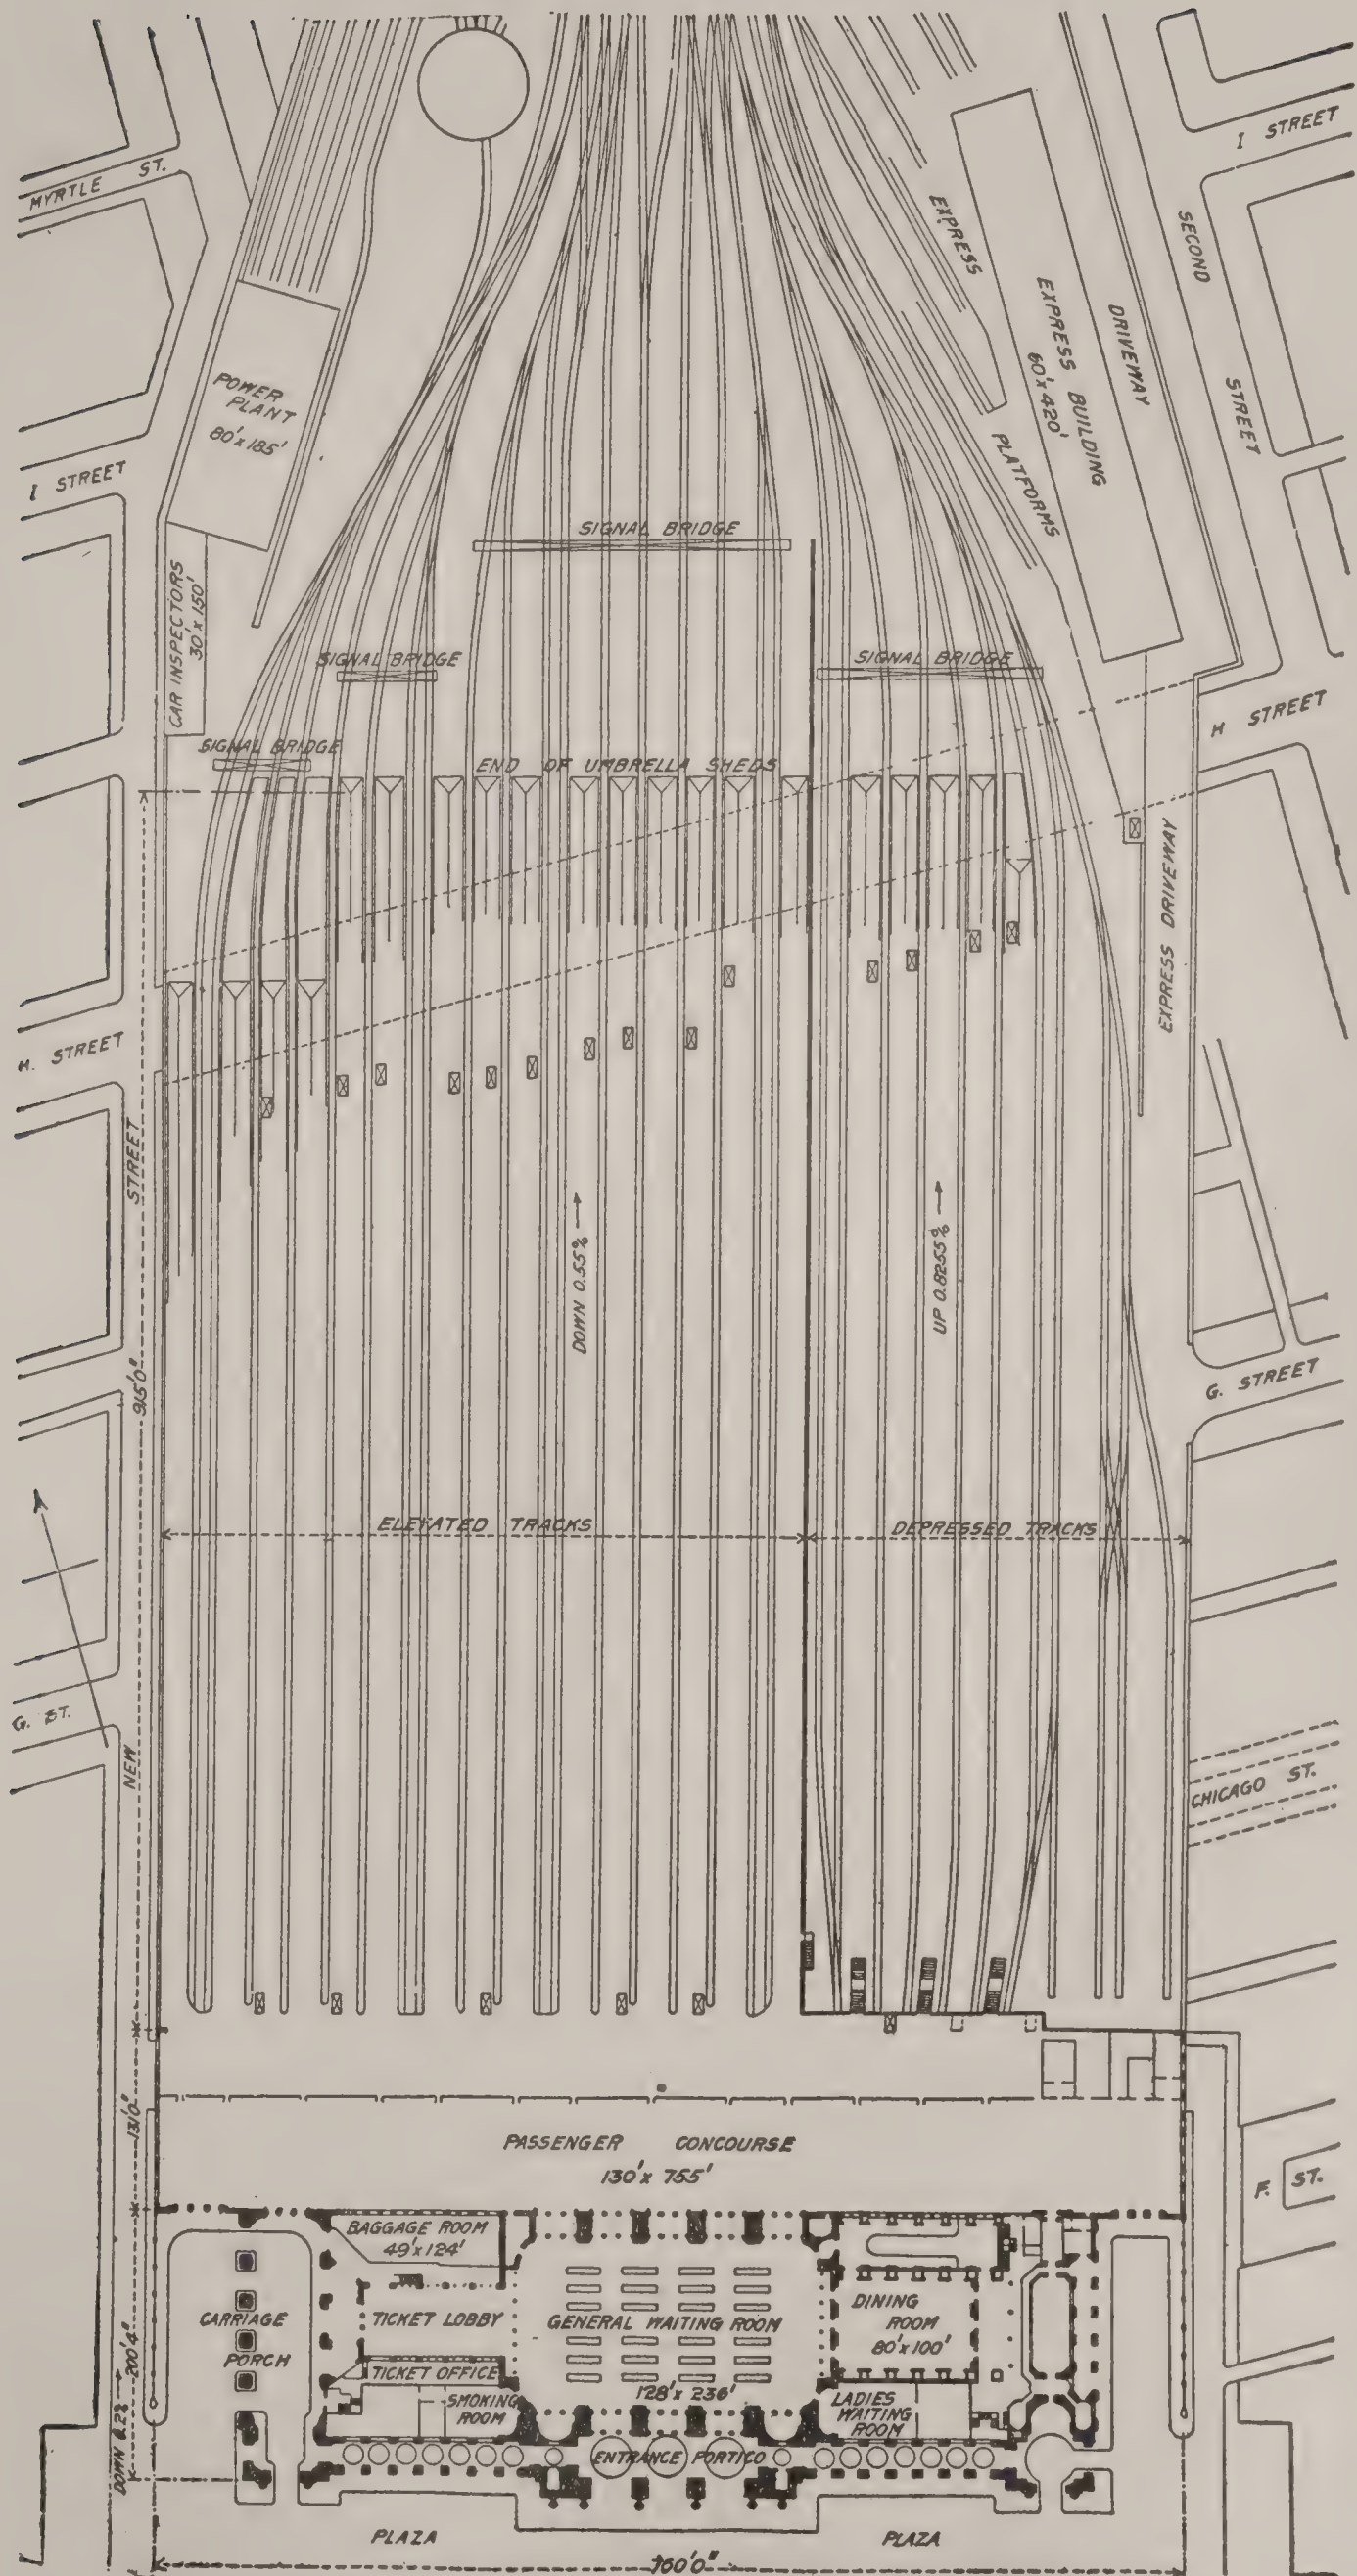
PLATE X.—Plan at Street Level. Union Terminal, Washington, D. C.
